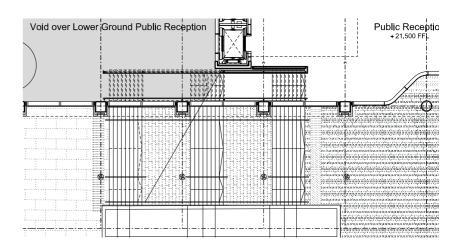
(above): Extracts from drawings showing handrail arrangements on steps between B1 and B3 as approved (above) and proposed (middle). Below, a CGI shows the revised handrail arrangements on steps between B1 and B3.
